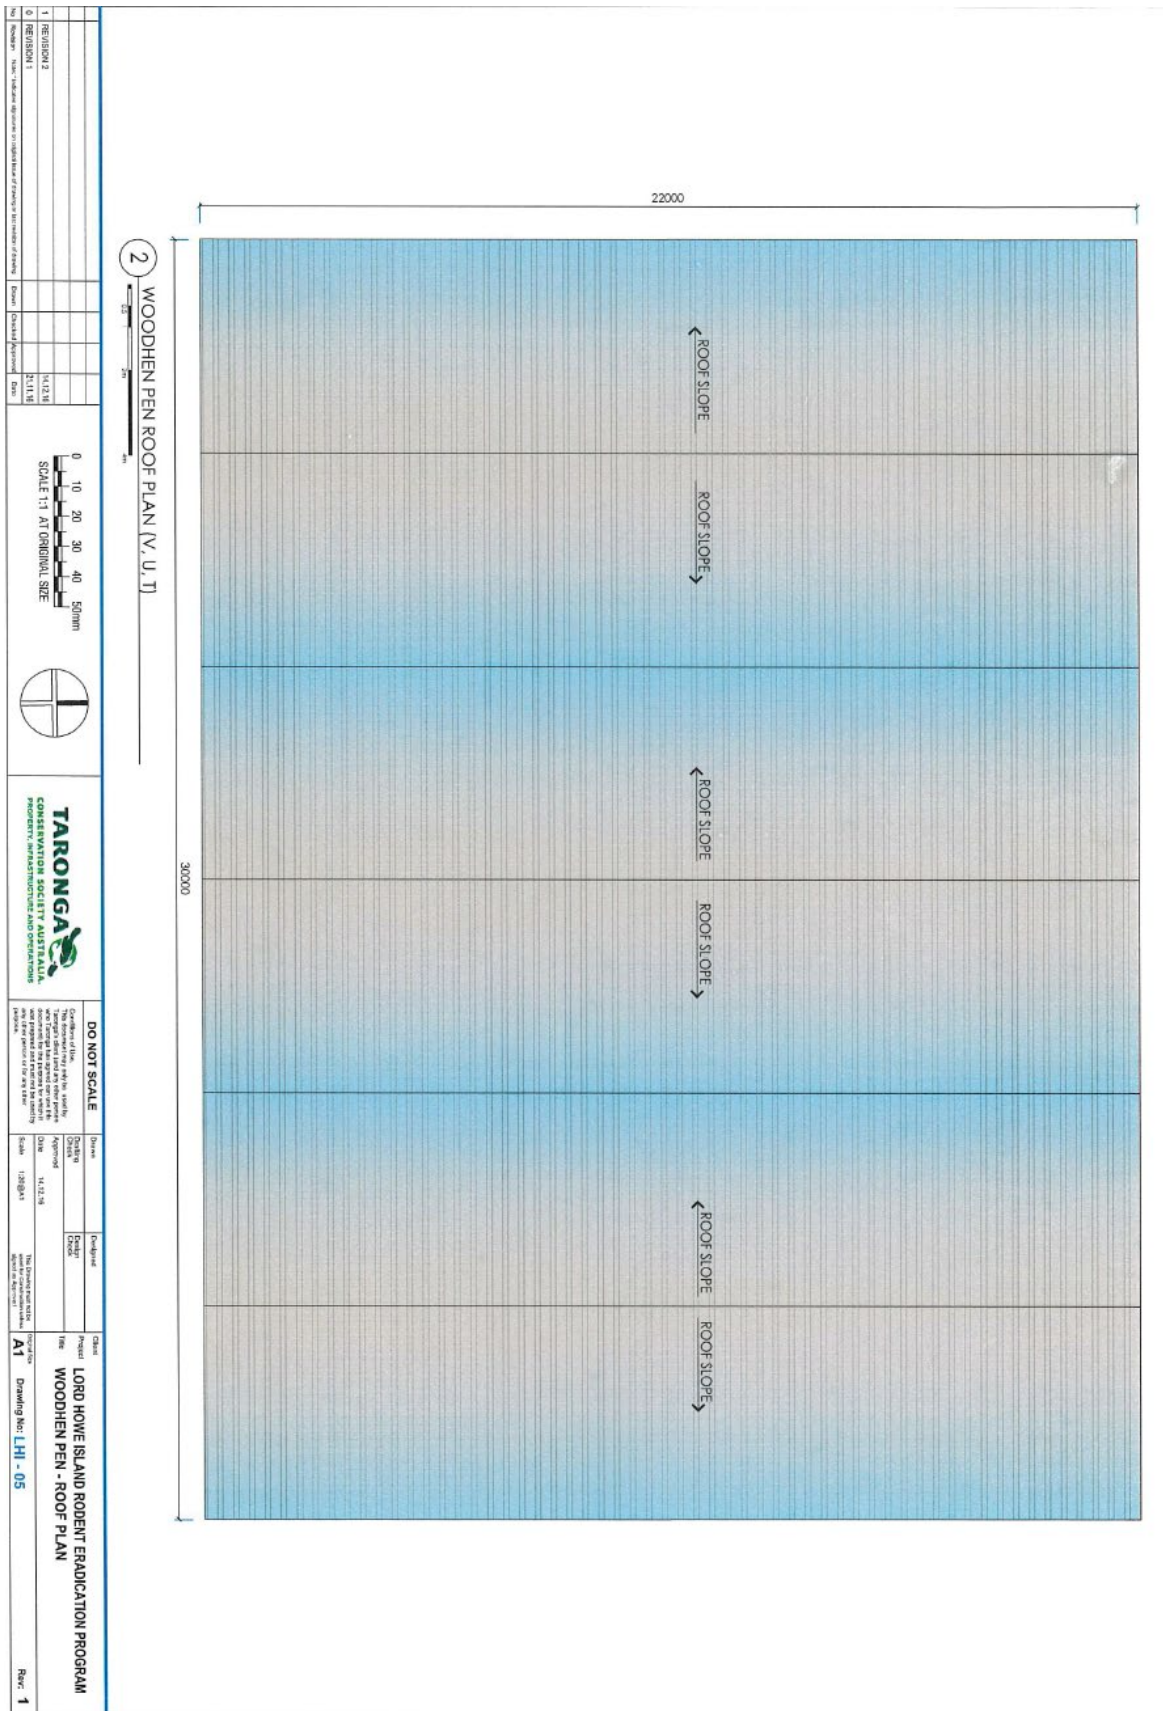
LHI Woodhen Pen V, U, T Roof Plan
